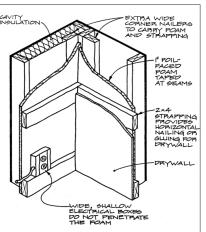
Extra nailers. With interior foam and strapping, remember to put corner nailers in the right places. Also, leave out the last stud where interior partitions join outside walls, so the foam board can run continuously.
